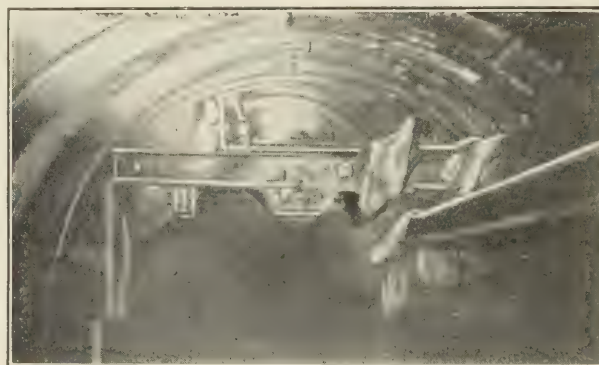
VIEW IN CRIB HEADING, SHOWING ROOF
